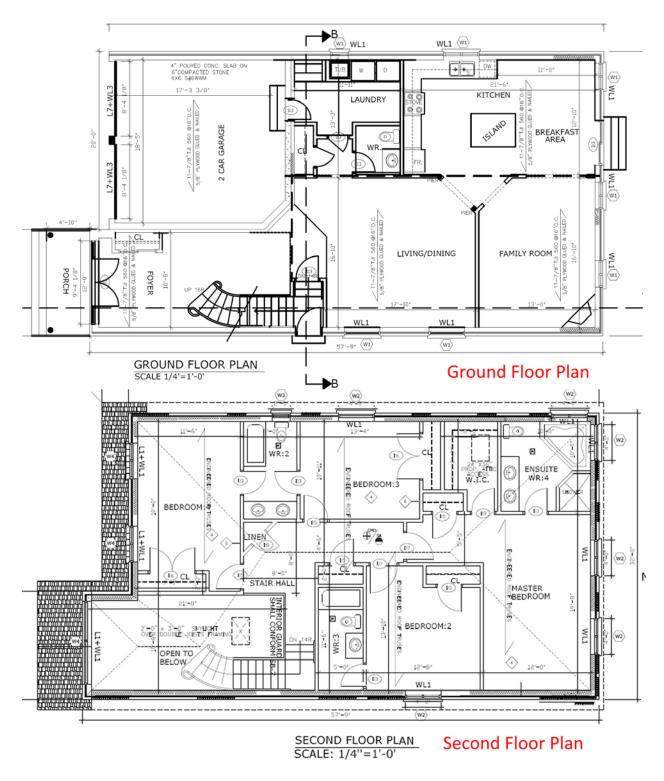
First and second floor plans of the proposed new residence, revised to show changes resulting from the elimination of the false balcony.
